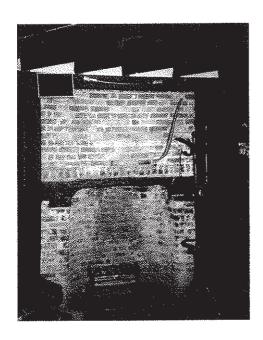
Original1703 diagonally-set corner fireplace, West bar
